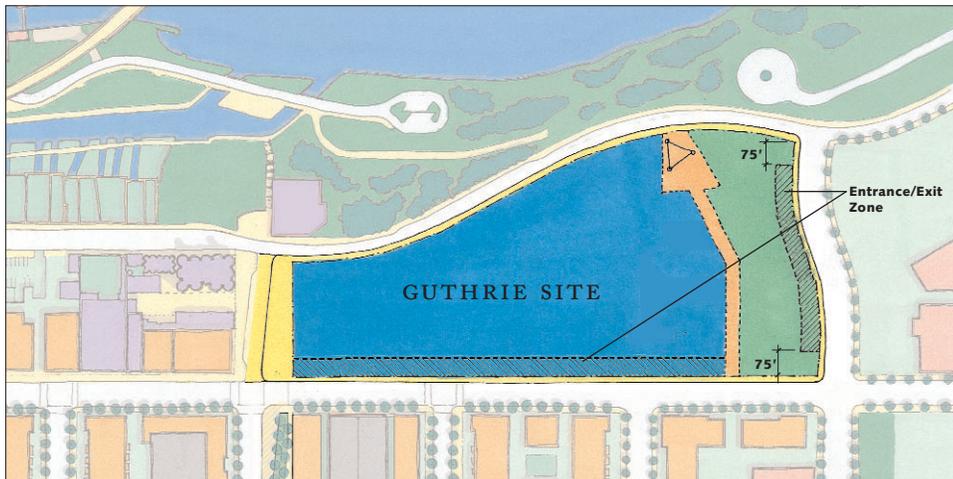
Parking Access – Parking access is not permitted along West River Parkway and will not be possible on the Chicago Avenue side of the building if a plaza is built. Parking access is possible on 2nd Street South but must not create conflicts with pedestrian movements or create traffic jams.
